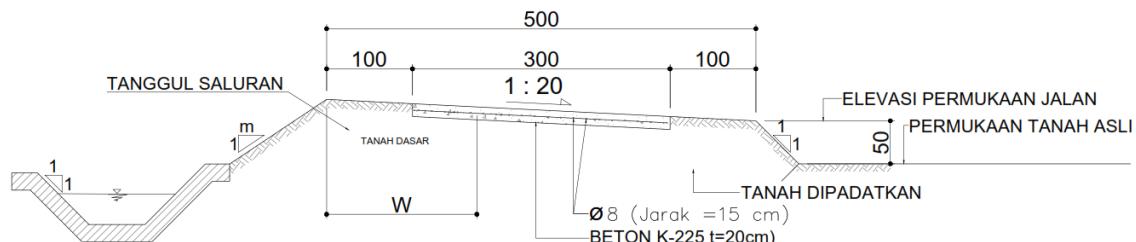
TYPICAL INSPECTION ROAD OF IRRIGATION CANAL OF CONDITION III
